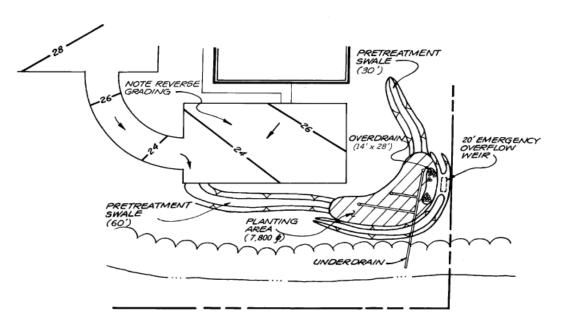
Bioretention Facility Layout Source: GSMM (2001)
